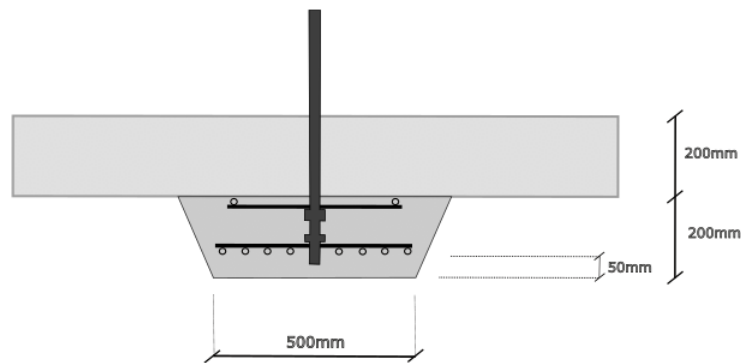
Drawing of the design of reinforced shotcrete arches constructed at the E4 Stockholm bypass project in rock class five Steiner (2016) (modified by the author).
